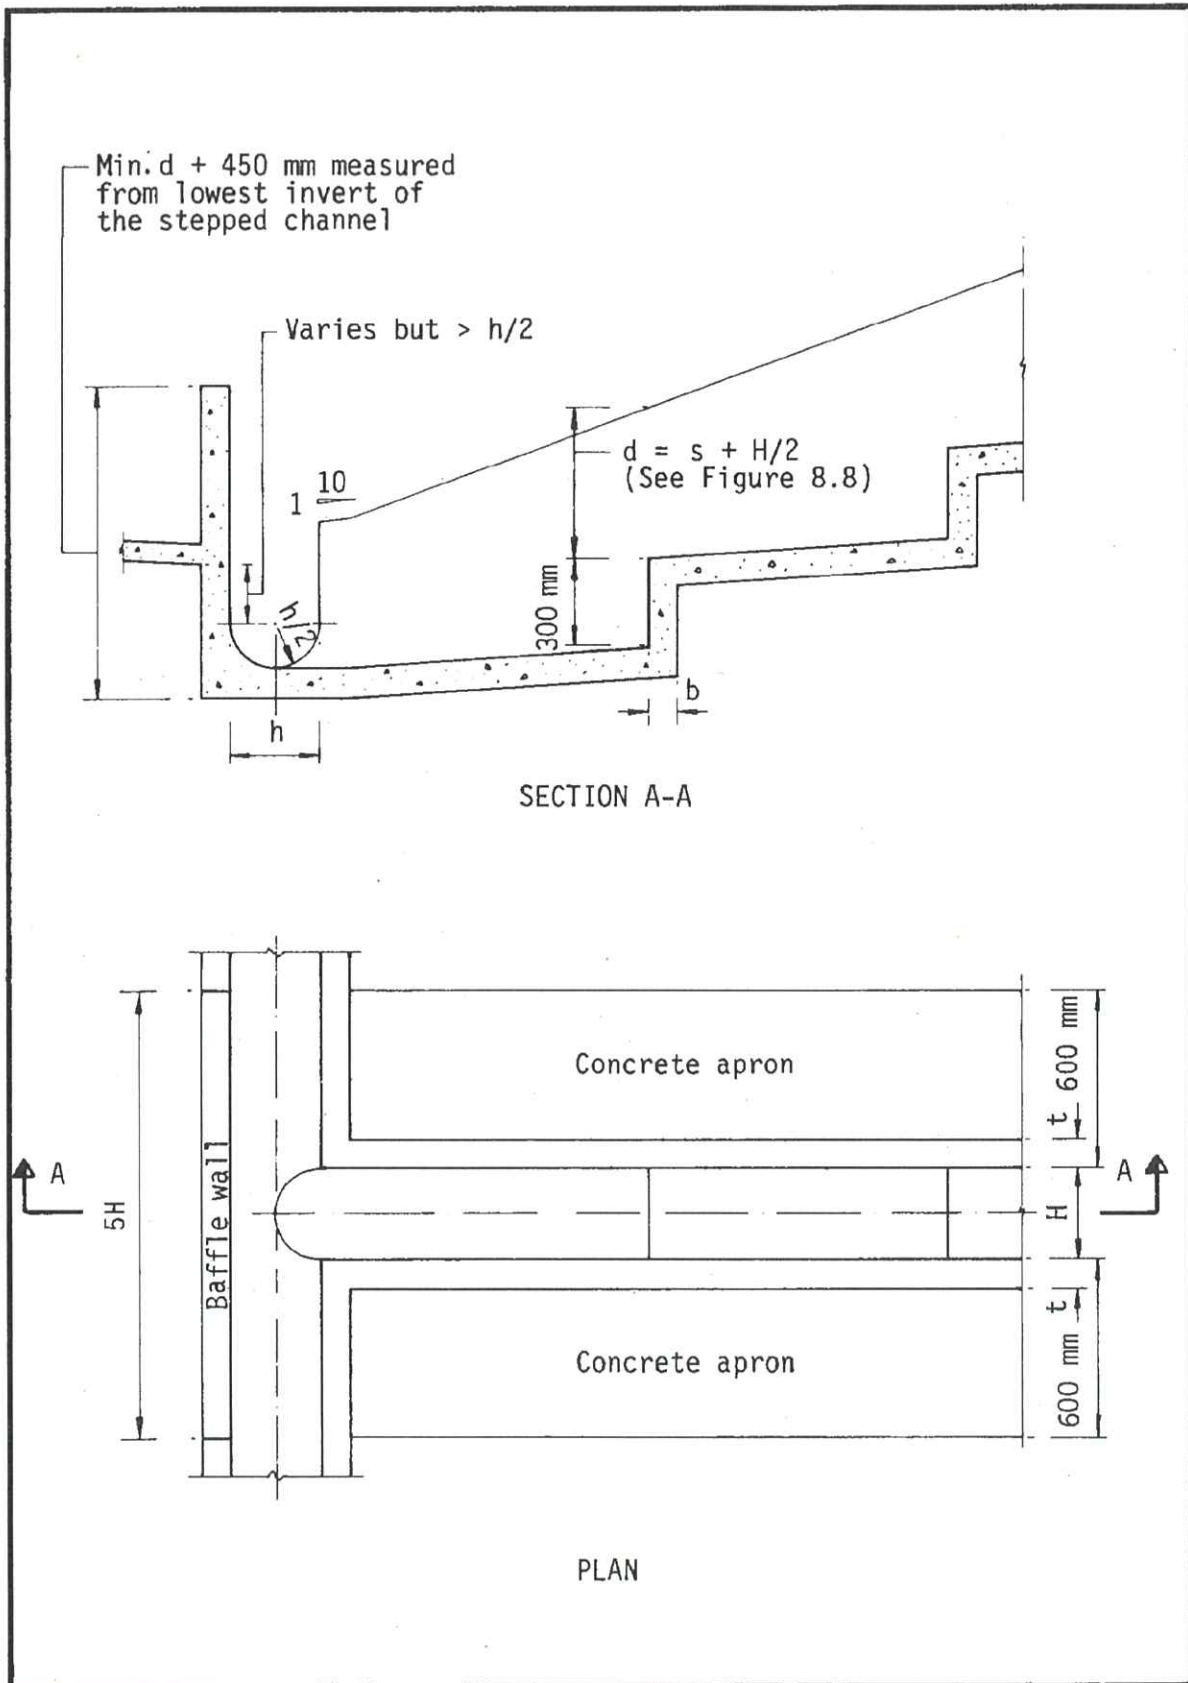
Typical Details of Junction of Stepped Channel and U-channel at Toe of Slope
